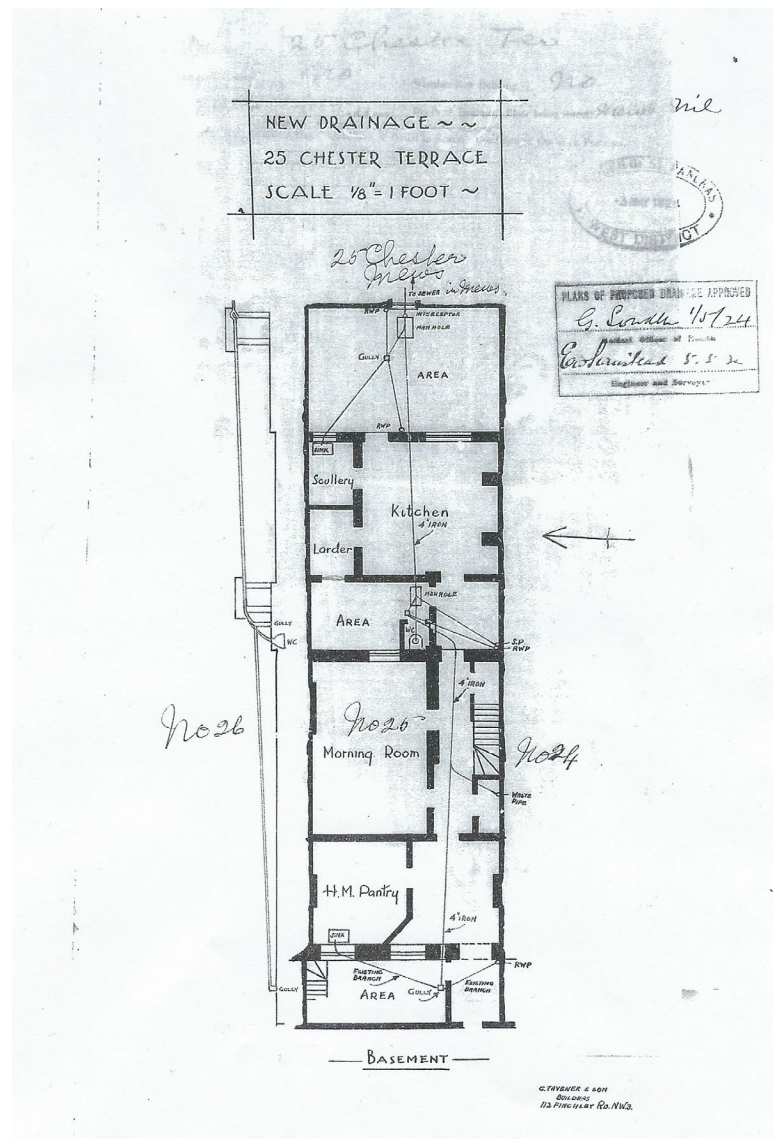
1924 Drainage Plan of No.25 Chester Terrace
